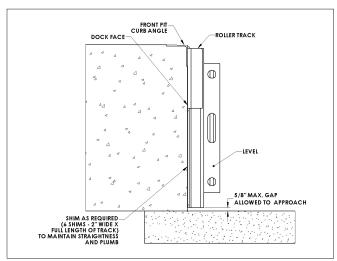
FIGURE D—WELDING ROLLER TRACK SIDE VIEW
